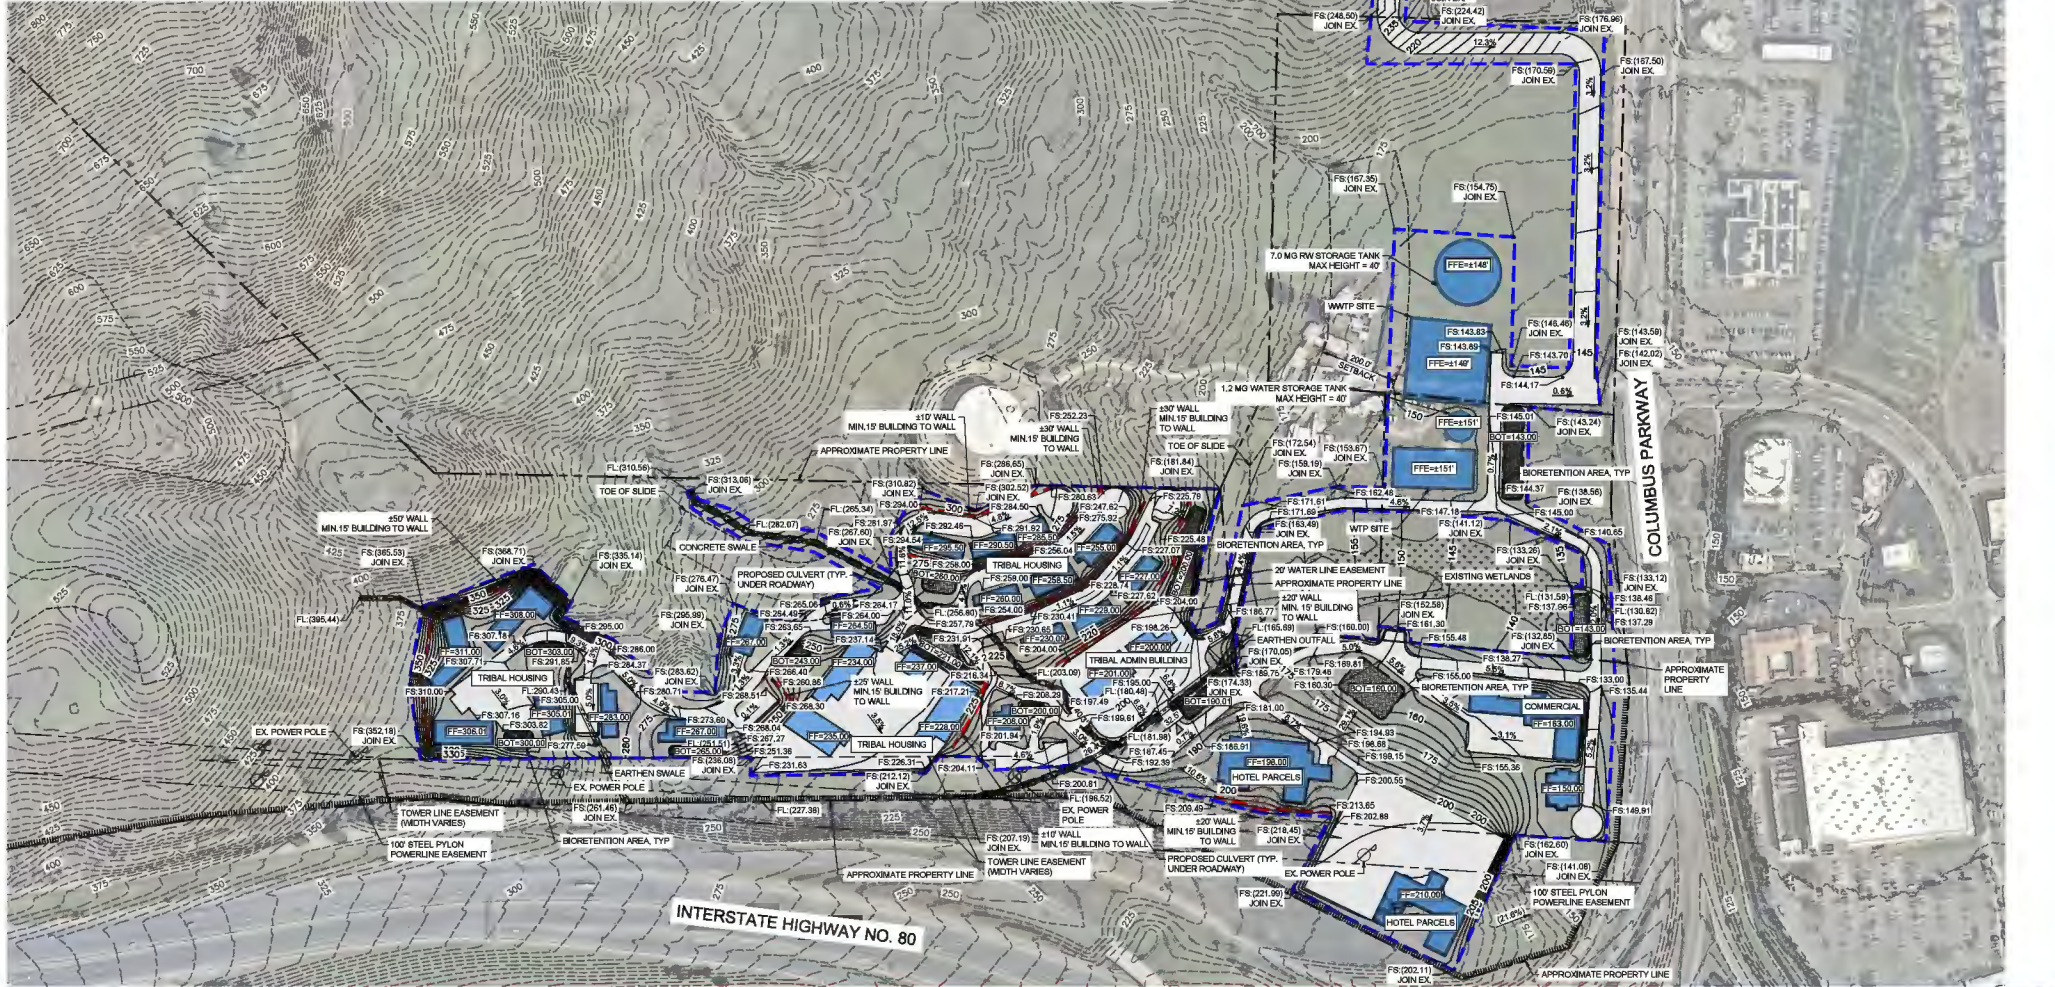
EXHIBIT E – PROPOSED PROJECT – STORMWATER MANAGEMENT
